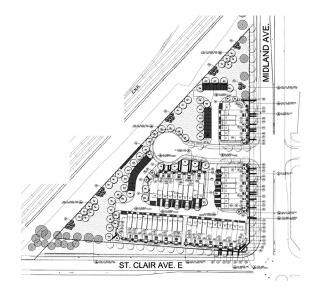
Site plan and elevations of the proposed 3640 St. Clair Avenue East development
